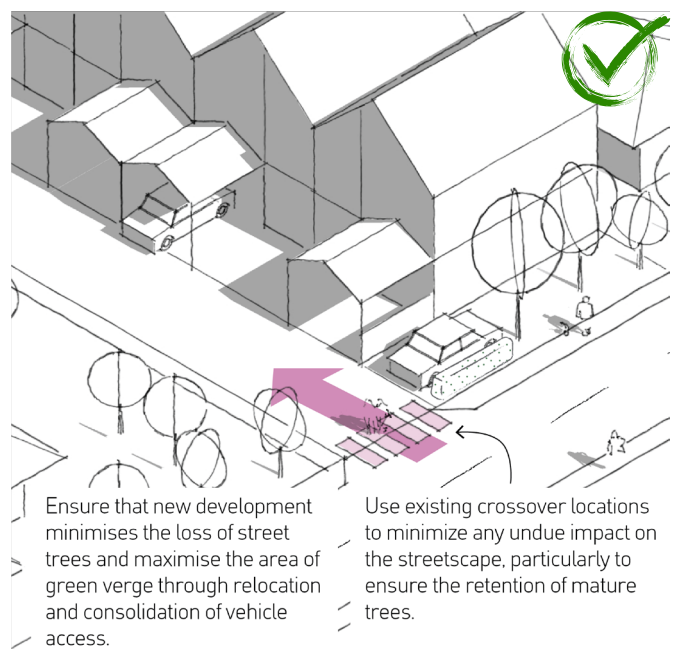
Single House and Grouped Dwellings - Vehicular Access Example Diagram
